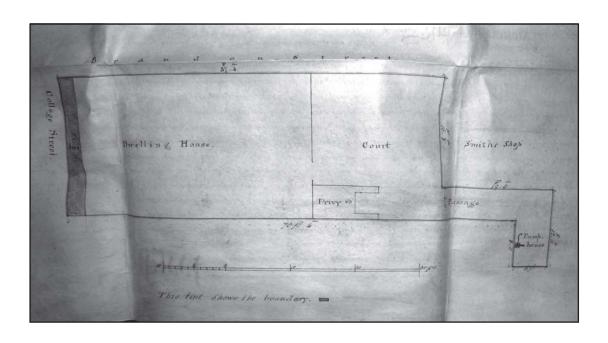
House plan for no. 54 College Street c.1820 (BRO 05502)
